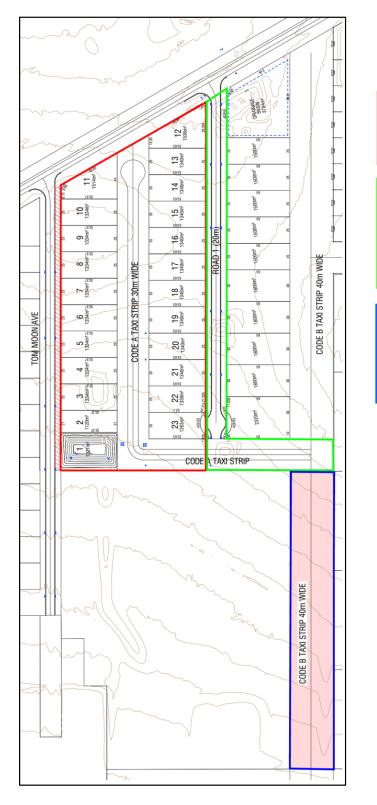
Subdivision plan (in context with adjacent lands and works needed to facilitate the subdivision)
